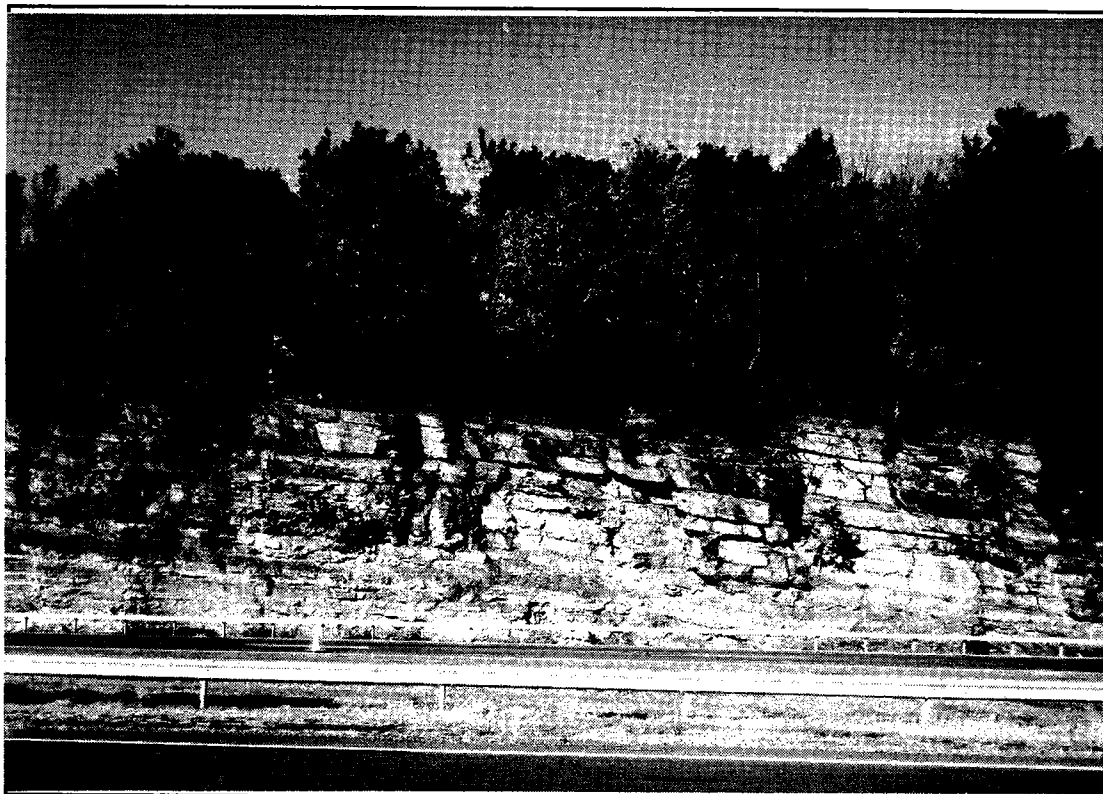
Photograph at milepost 102.5-103.0 showing undermined blocks of Port Ewen limestone; view looking west.
